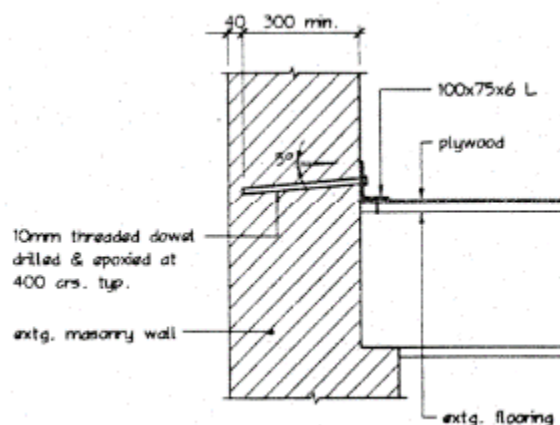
Excerpt From 1990s Strengthening Drawings
